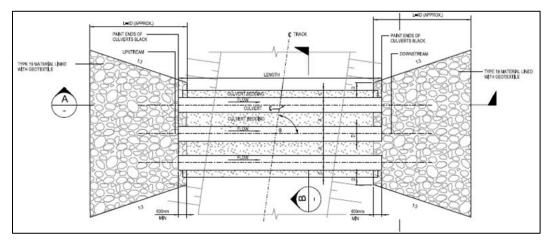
Plan – Multiple Pipe Culvert with Erosion Protection
